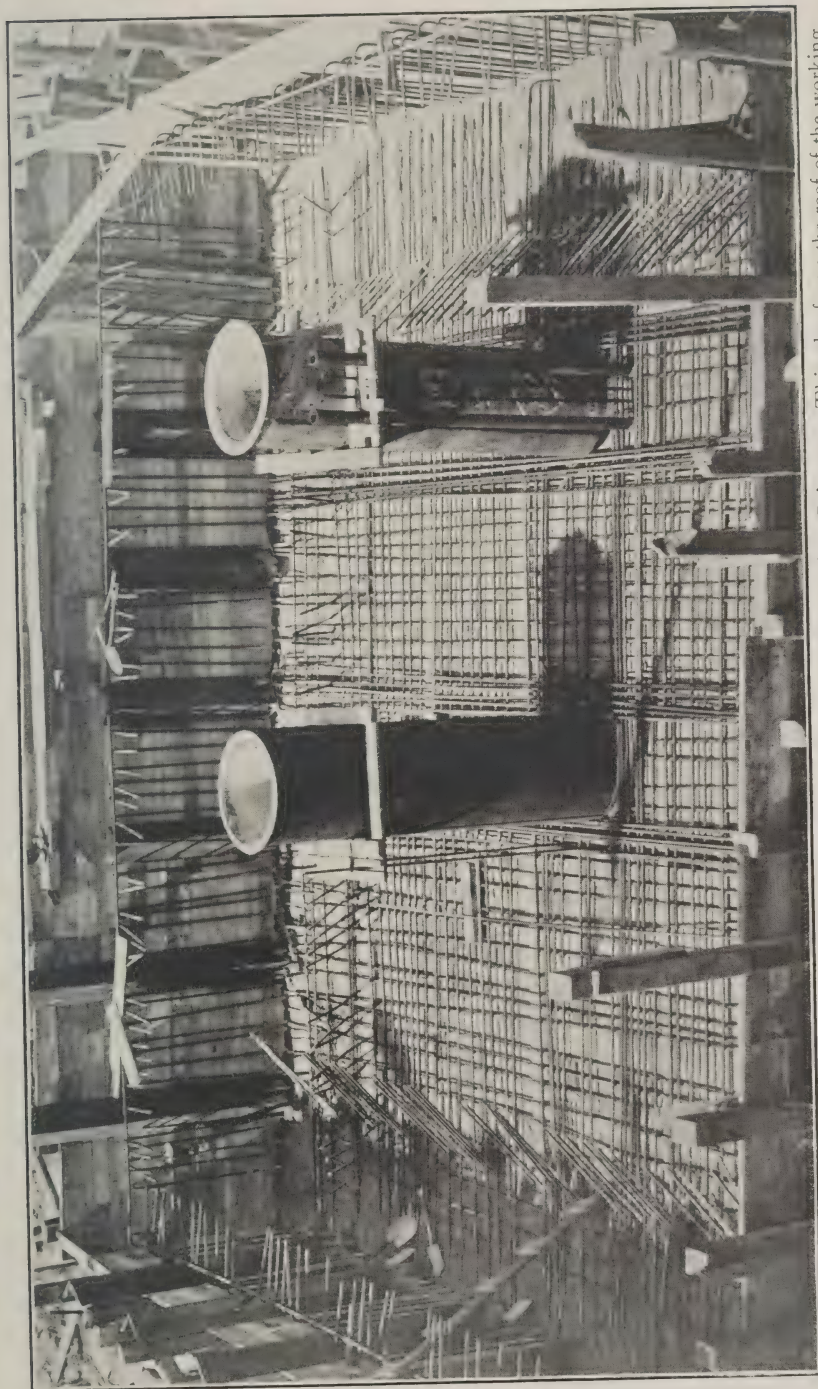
Steel Reinforcement of Concrete at Bottom of 40 by 40 foot and 30 by 32 foot Caissons. This also forms the roof of the working chamber. Similar reinforcement is placed 6 feet above that shown in the illustration.
